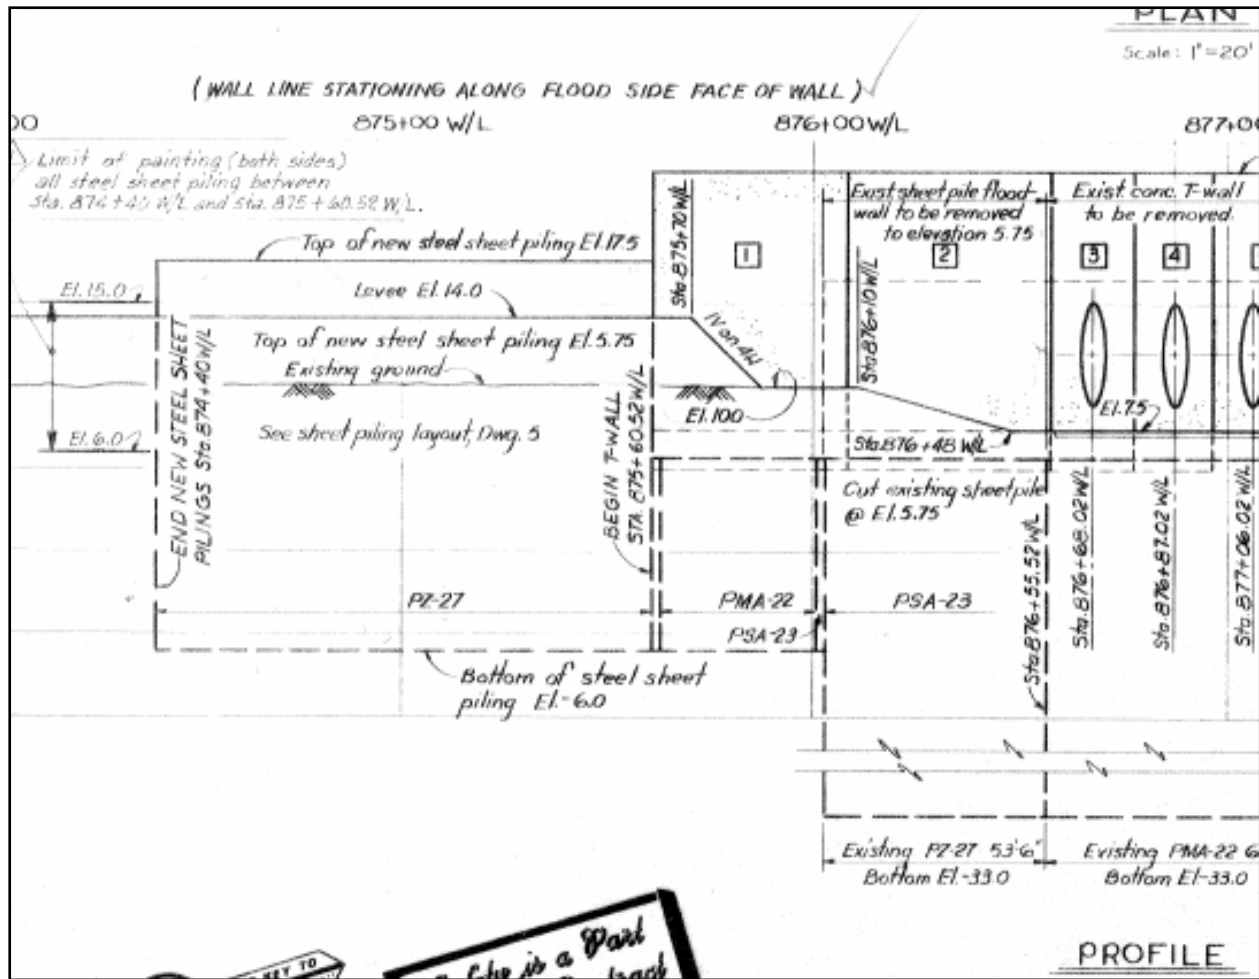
NOE2_G Profile View Showing 27' Difference Between Bottom Elevations of Existing (pre-1977) and Newer (1977 construction) Sheet Pile. Sections are from Plate 2 of 16, Mod P00001, Contract DACW29-77-C-0037
